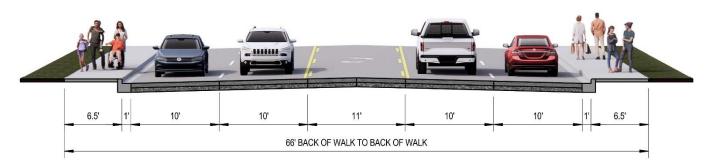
Pavement Replacement as a Narrow 5-Lane Facility with Monolithic Sidewalk, facing north
